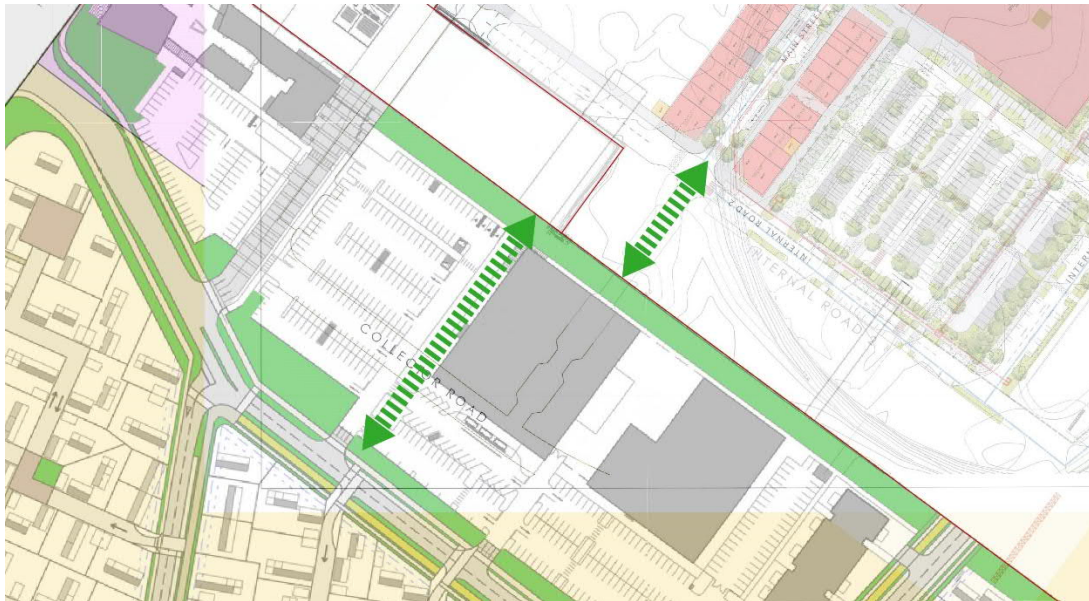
Misalignment of Green Corridor and Main Street between the two proposals
